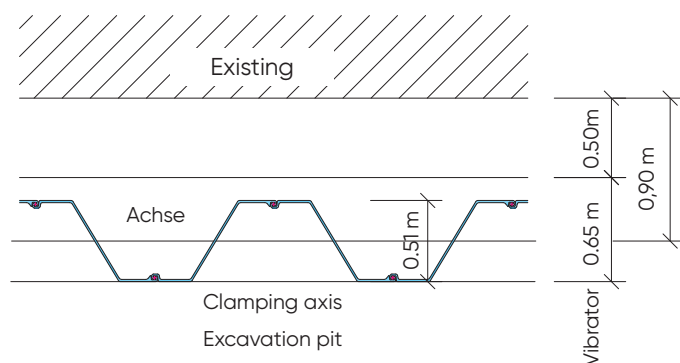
Distance between sheet pile wall axis and outer edge of existing structure.
